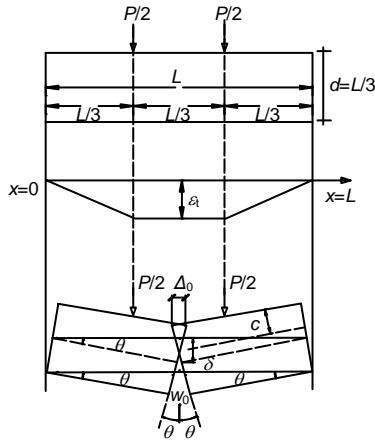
Failure mode of fiber reinforced concrete beam in the four point bending test
